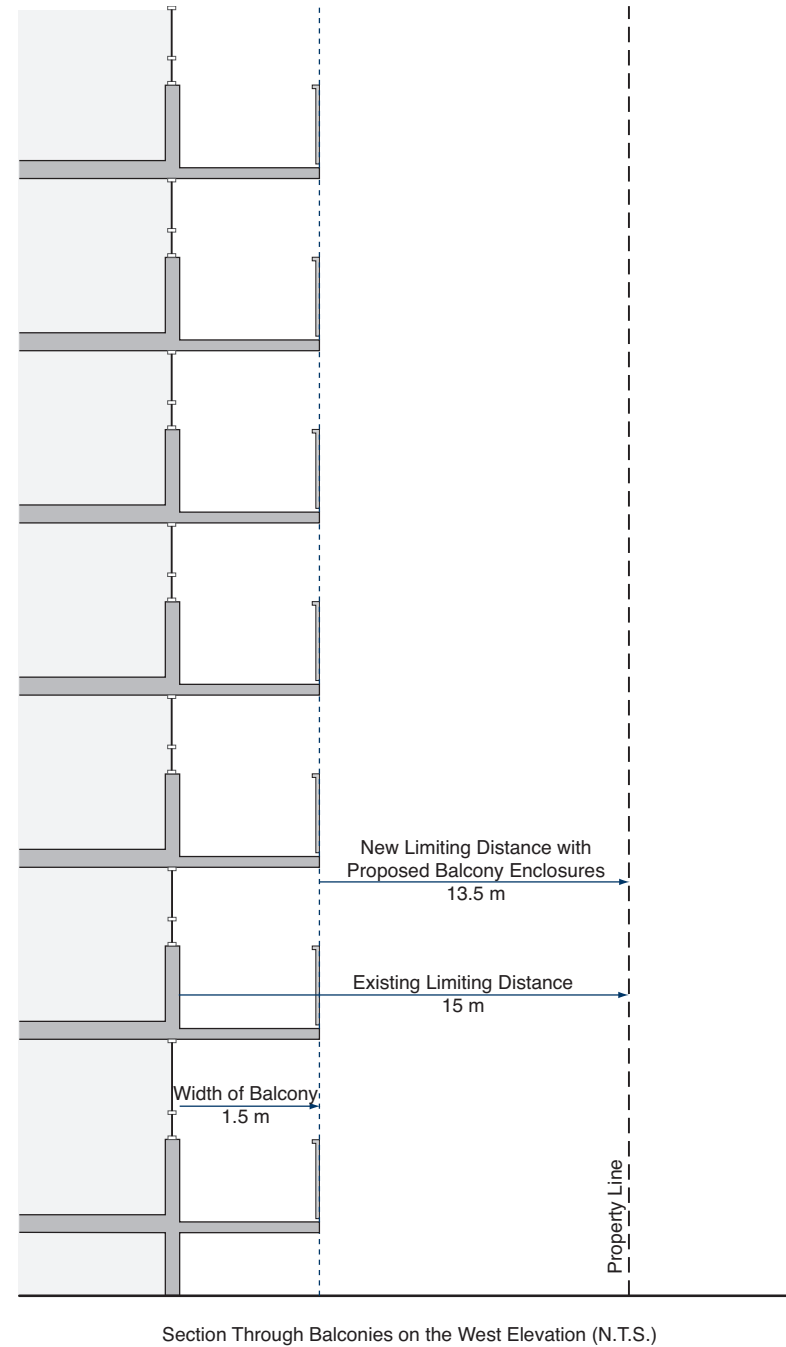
A section through the building is used to establish the new limiting distance with proposed balcony enclosures. Note that an accurate survey is needed to properly determine the existing limiting distance.
